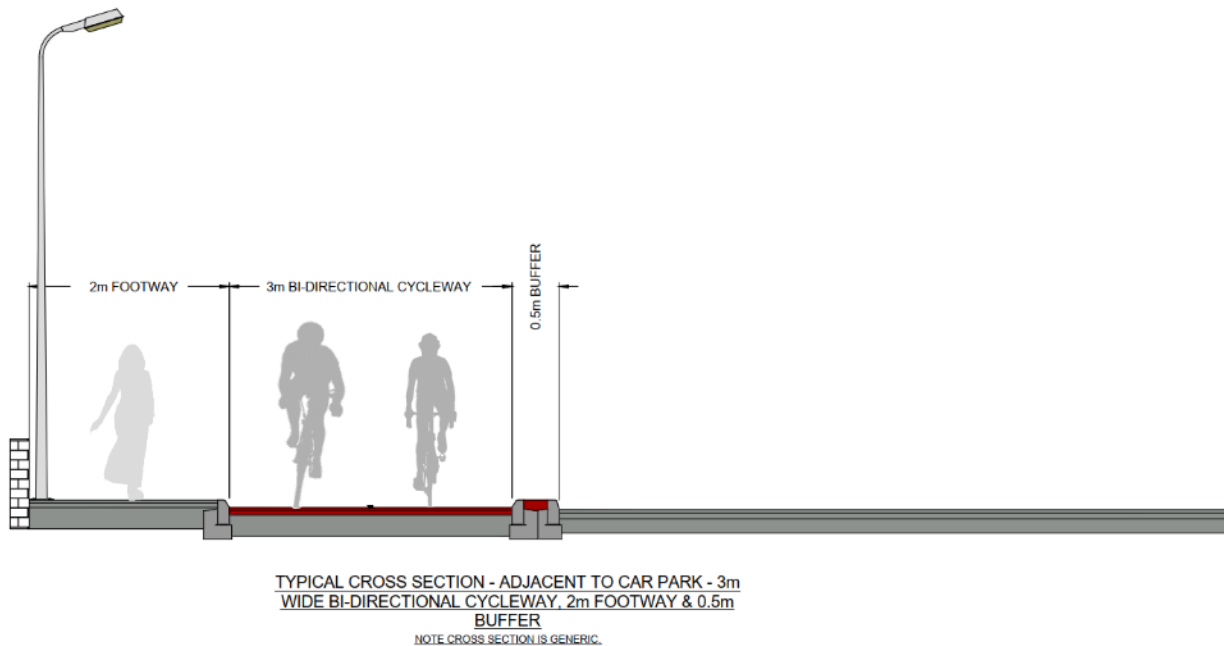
Pavilion Road / Wellington Square Typical Cross Section
